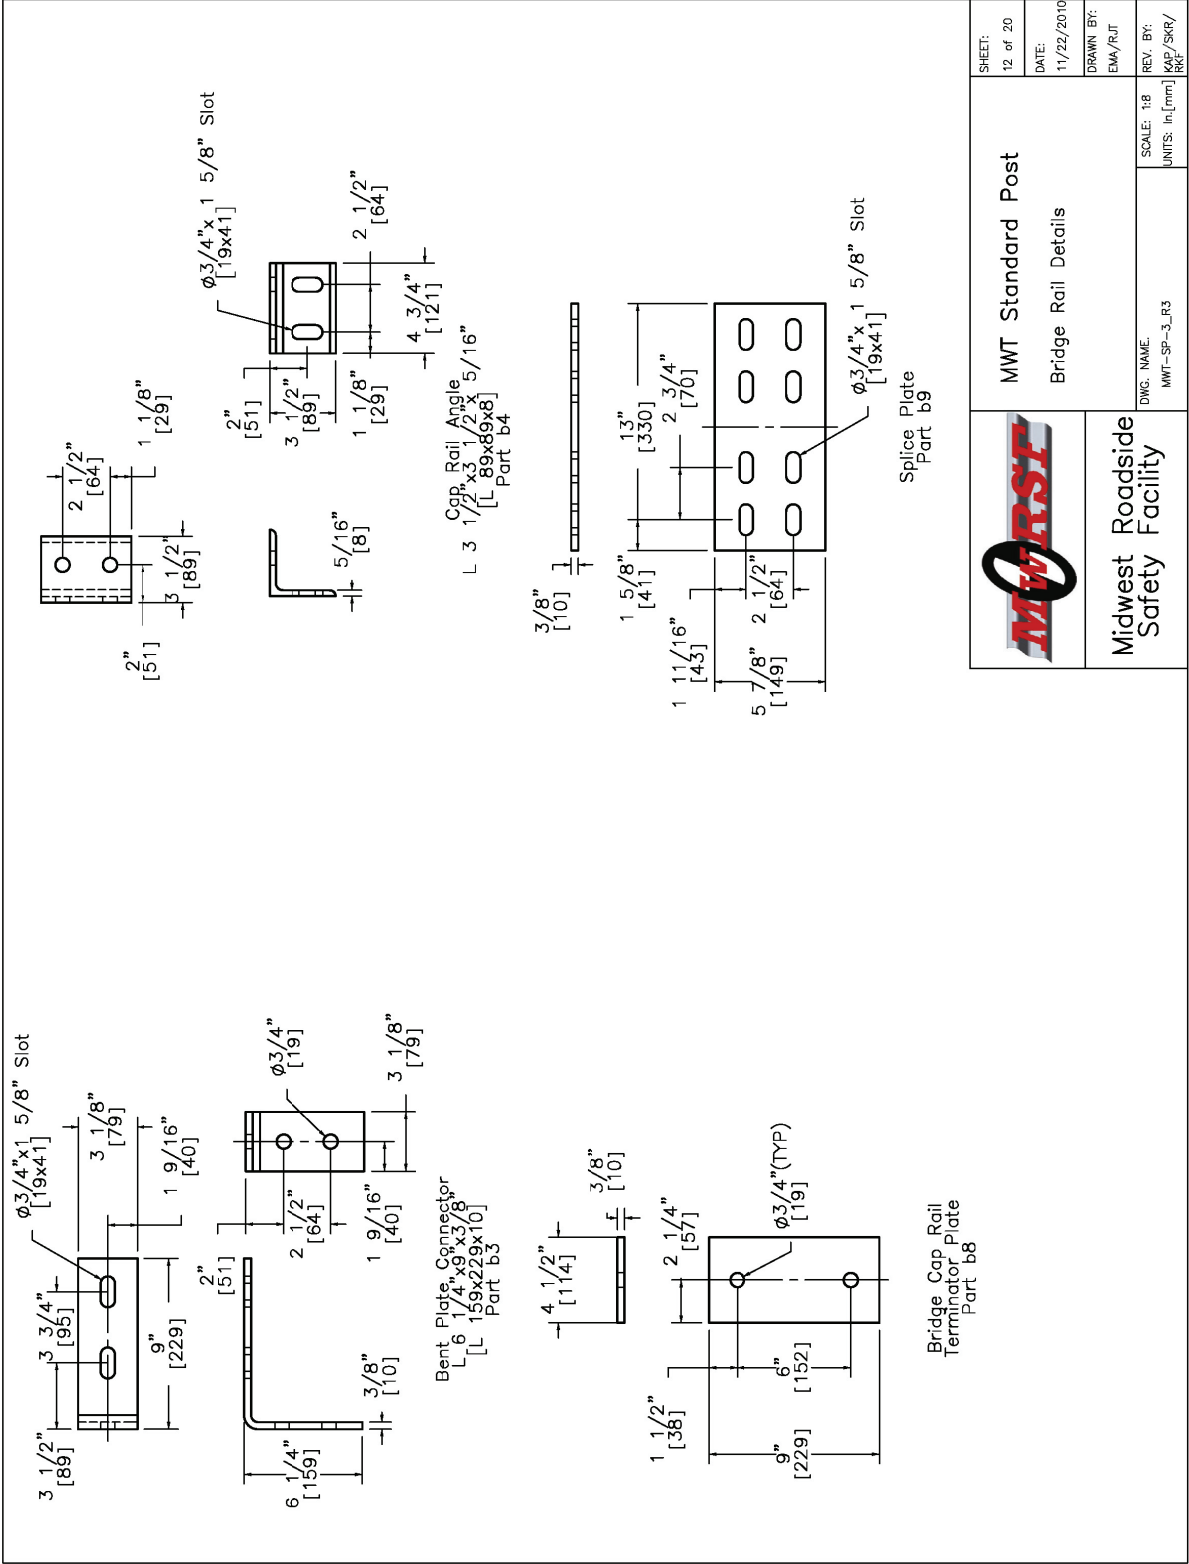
Bridge Rail Cap Connection Details, Test Nos. MWTSP-1 through 3
